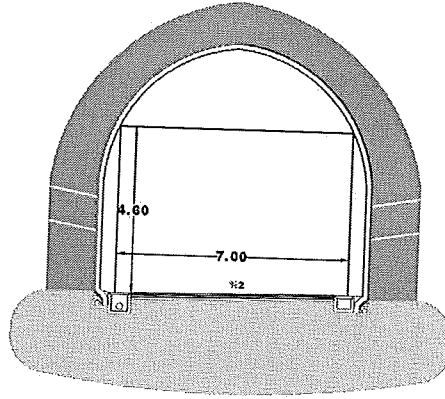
Cross-section of Dorukhan Tunnel after Rehabilitation
